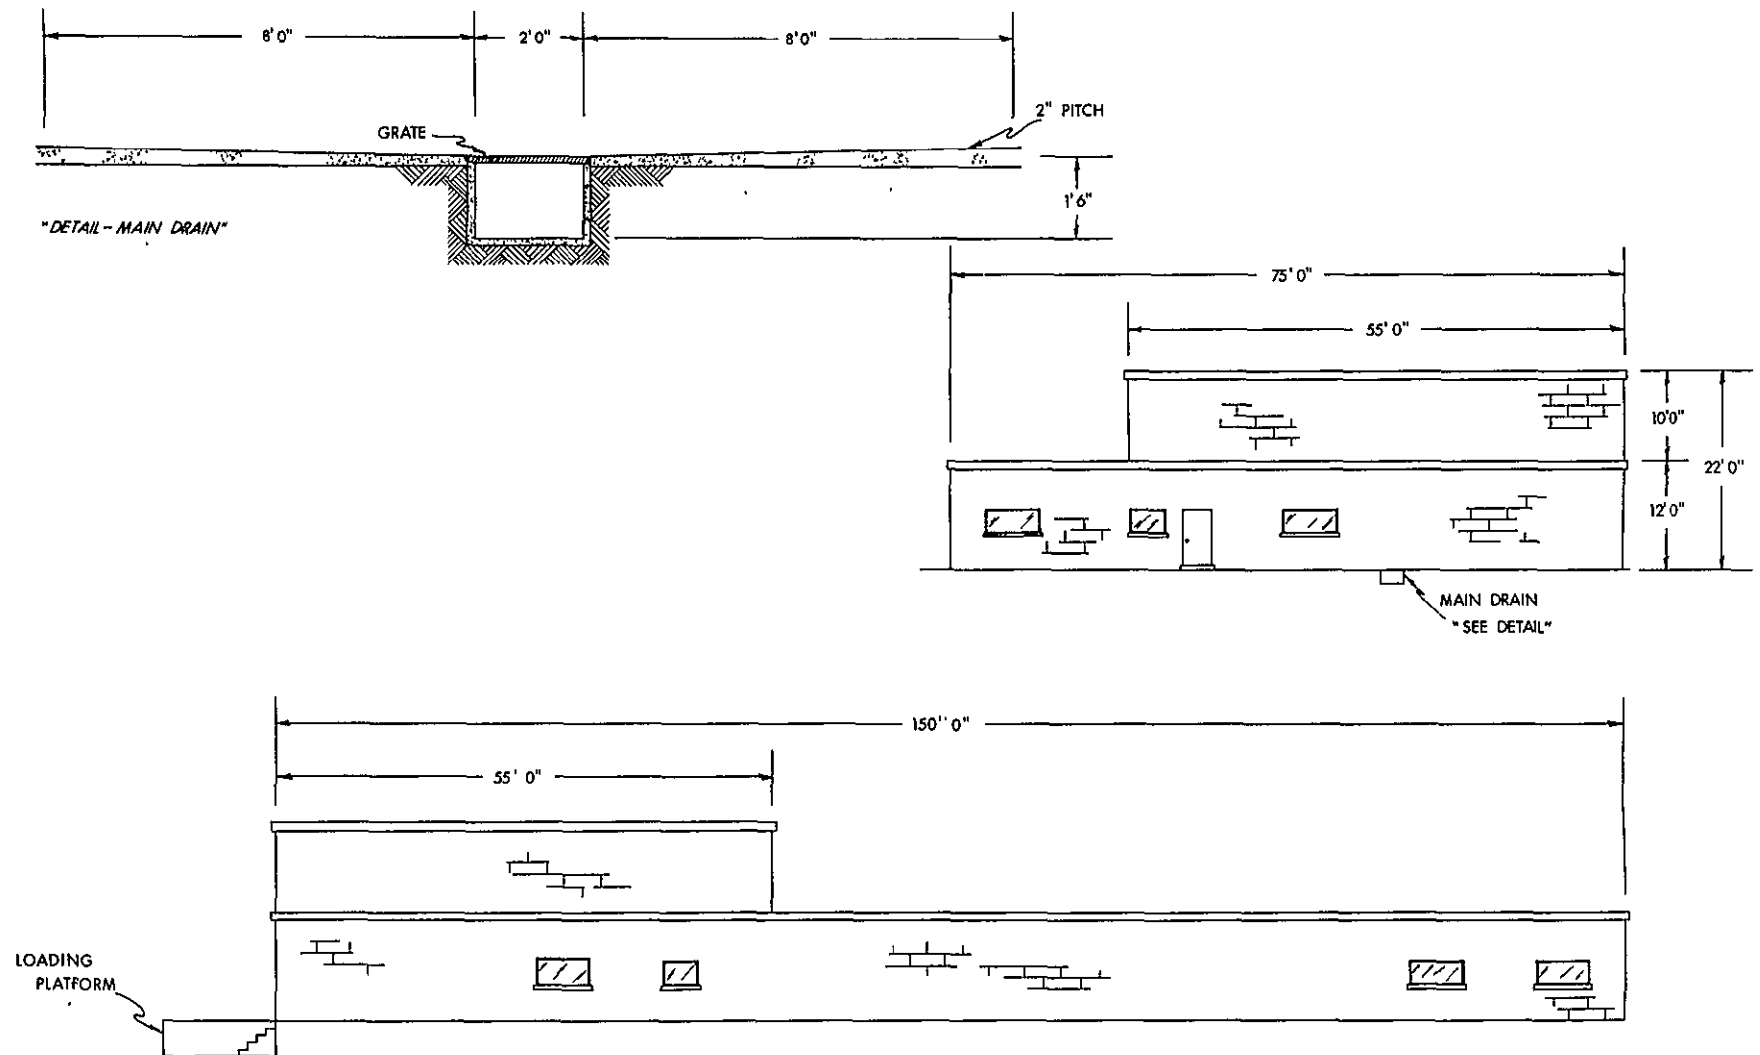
Elevation Plan of Proposed Photographic Processing Laboratory (PPL) Showing Detail of Main Drain
